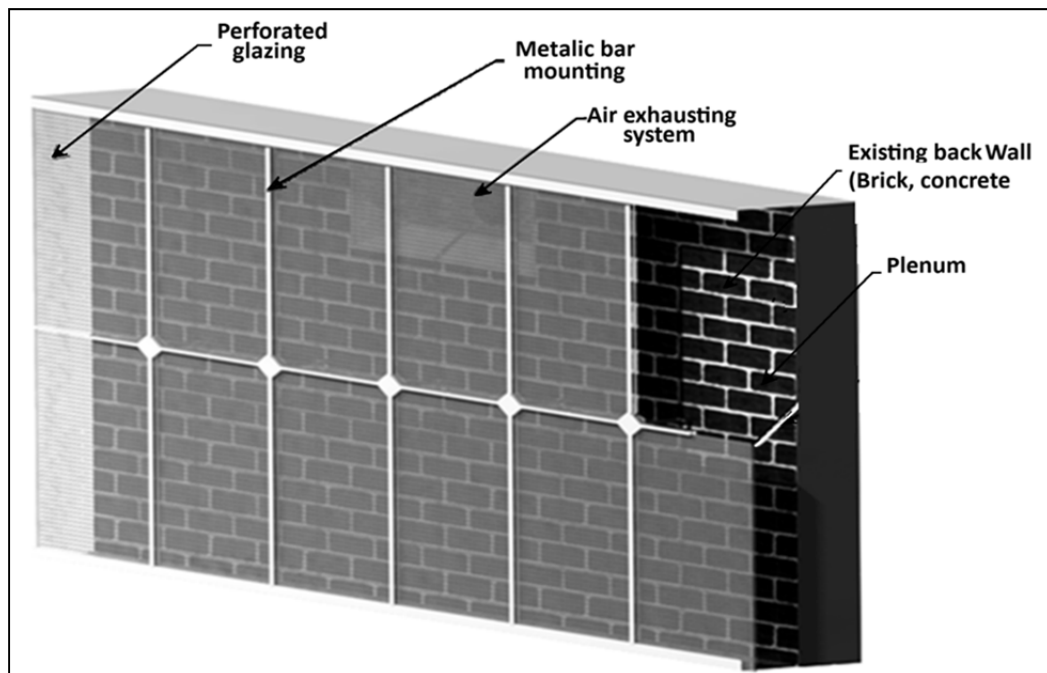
Schematic of the transparent transpired collector mounted on a typical brick wall construction
